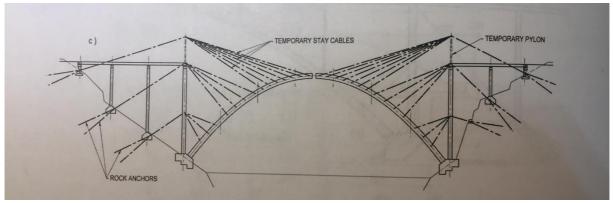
CONSTRUCTION TECHNOLOGY CONSTRUCTION FROM BOTH ENDS
